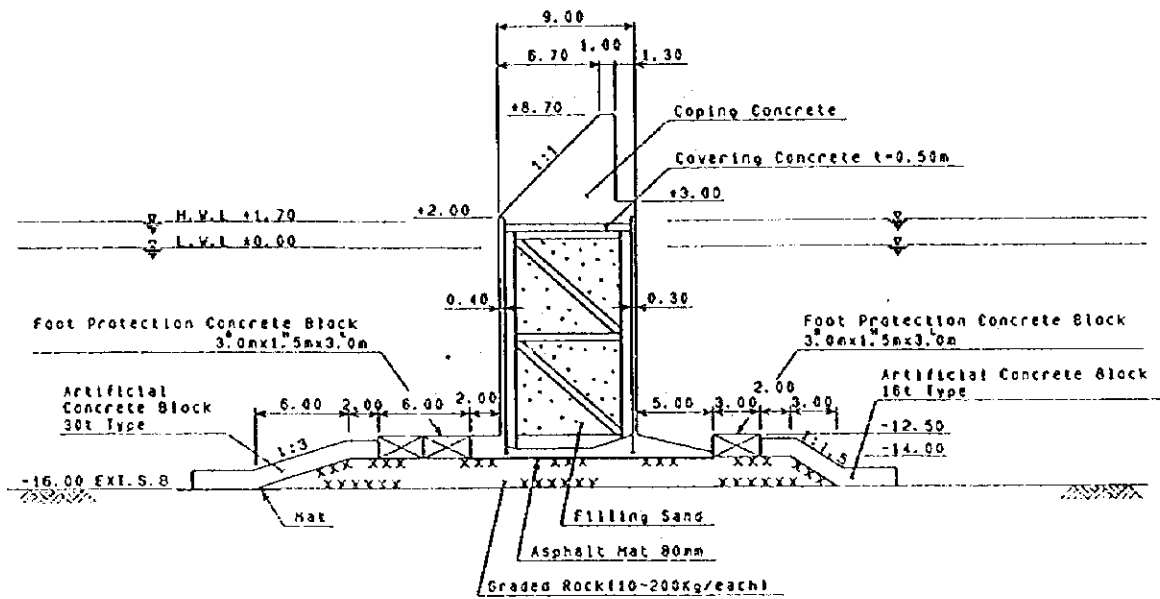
Typical Cross Section of Breakwater in Dung Quat(Hybrid Caisson)
